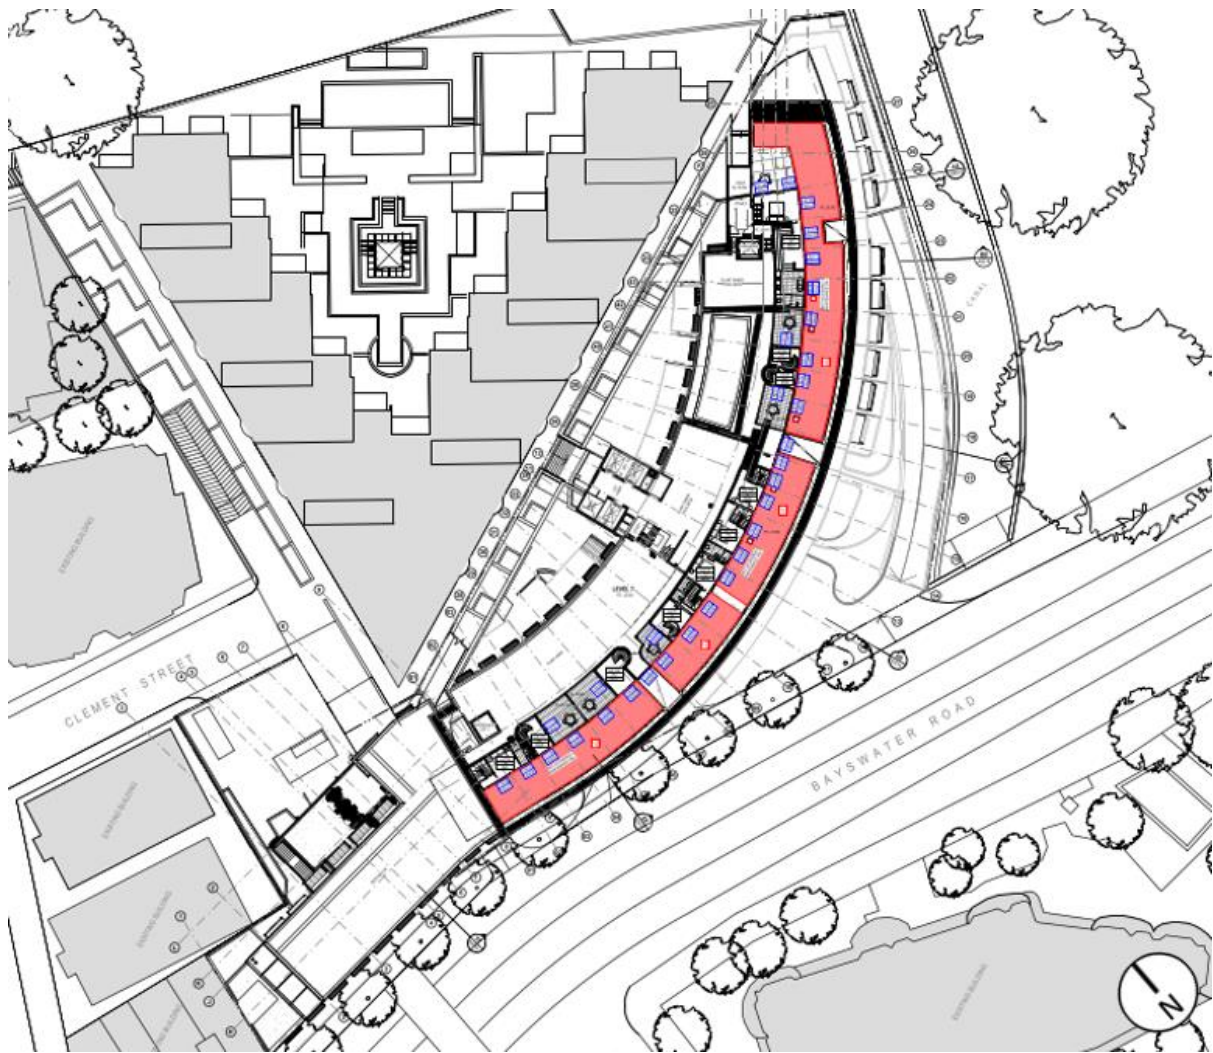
Proposed Level 7 (with proposed roof modification from synthetic turf to river pebbles shown in red)
